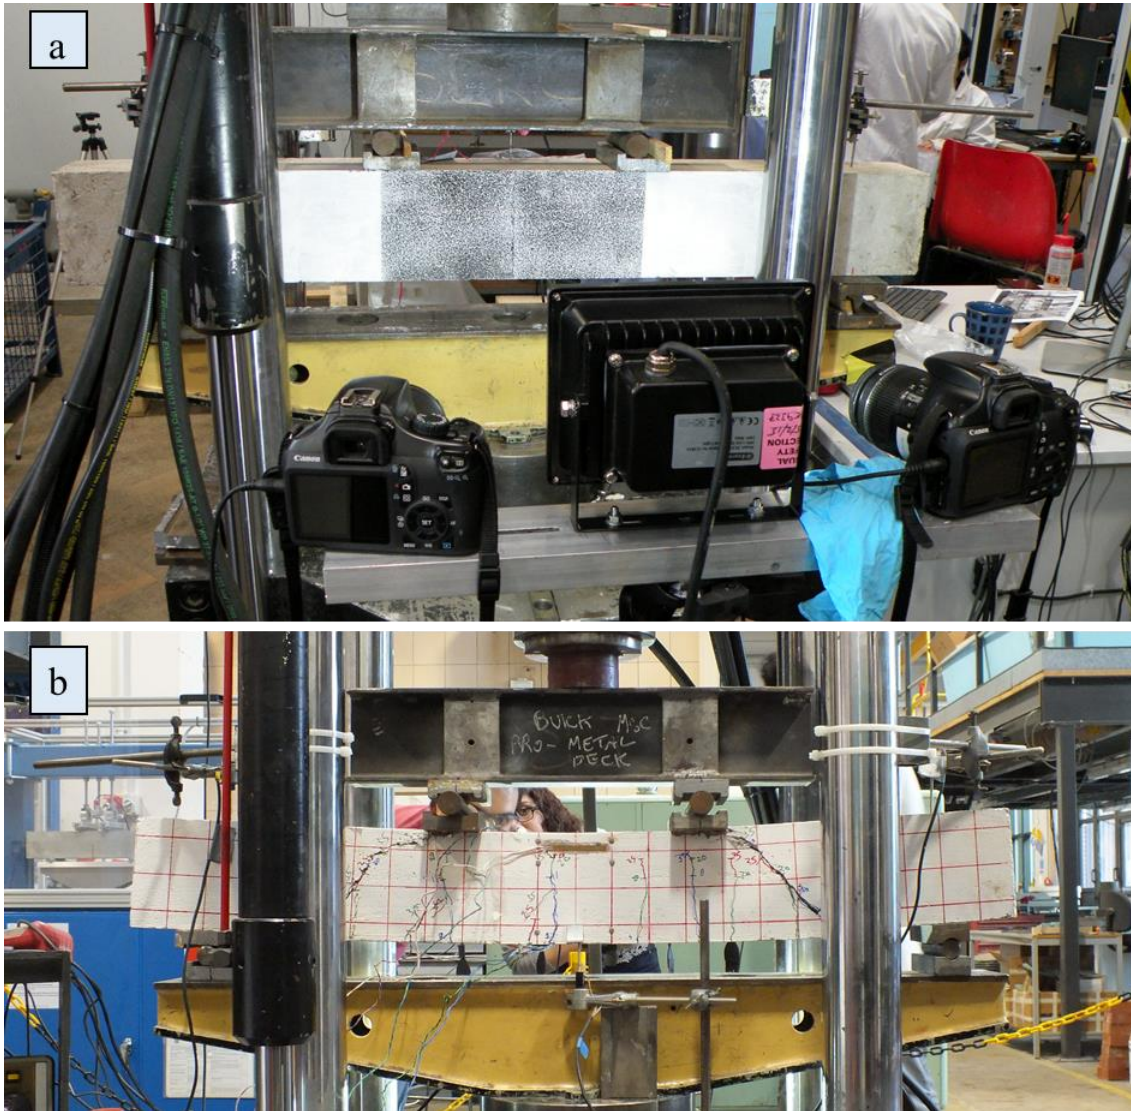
16: Test set-up for flexural test on GFRP RC specimens (a) DIC measurement (b) traditional measurement.
